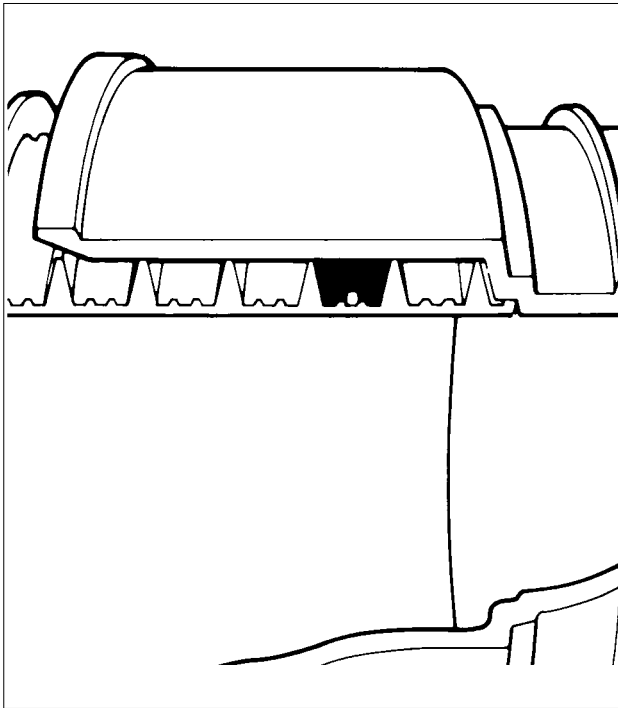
Manhole base — constructed using open channel manhole fittings. Typical installation
